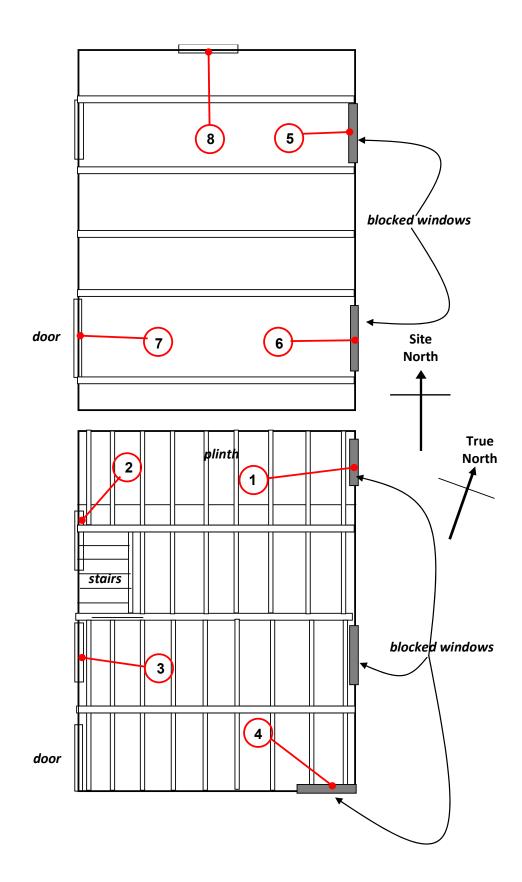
The north wing to show sampled lintels (first floor - top, ground floor - bottom)
